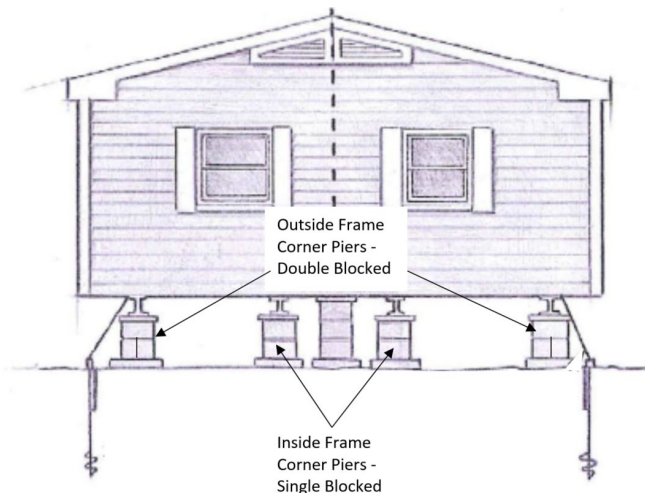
Corner Piers Under the Outside and Inside Frames of a Multi-Section Home
